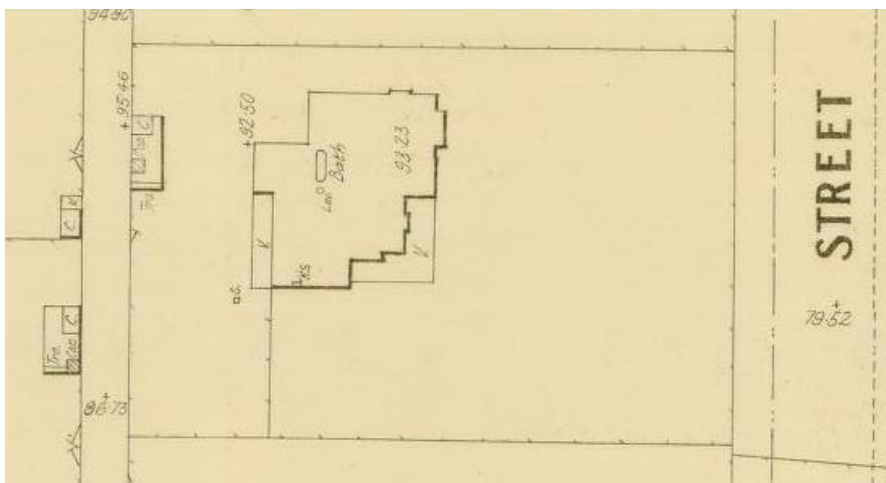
Extract from MMBW detail plan no 1777, dated 1907, Town of Malvern (SLV)
